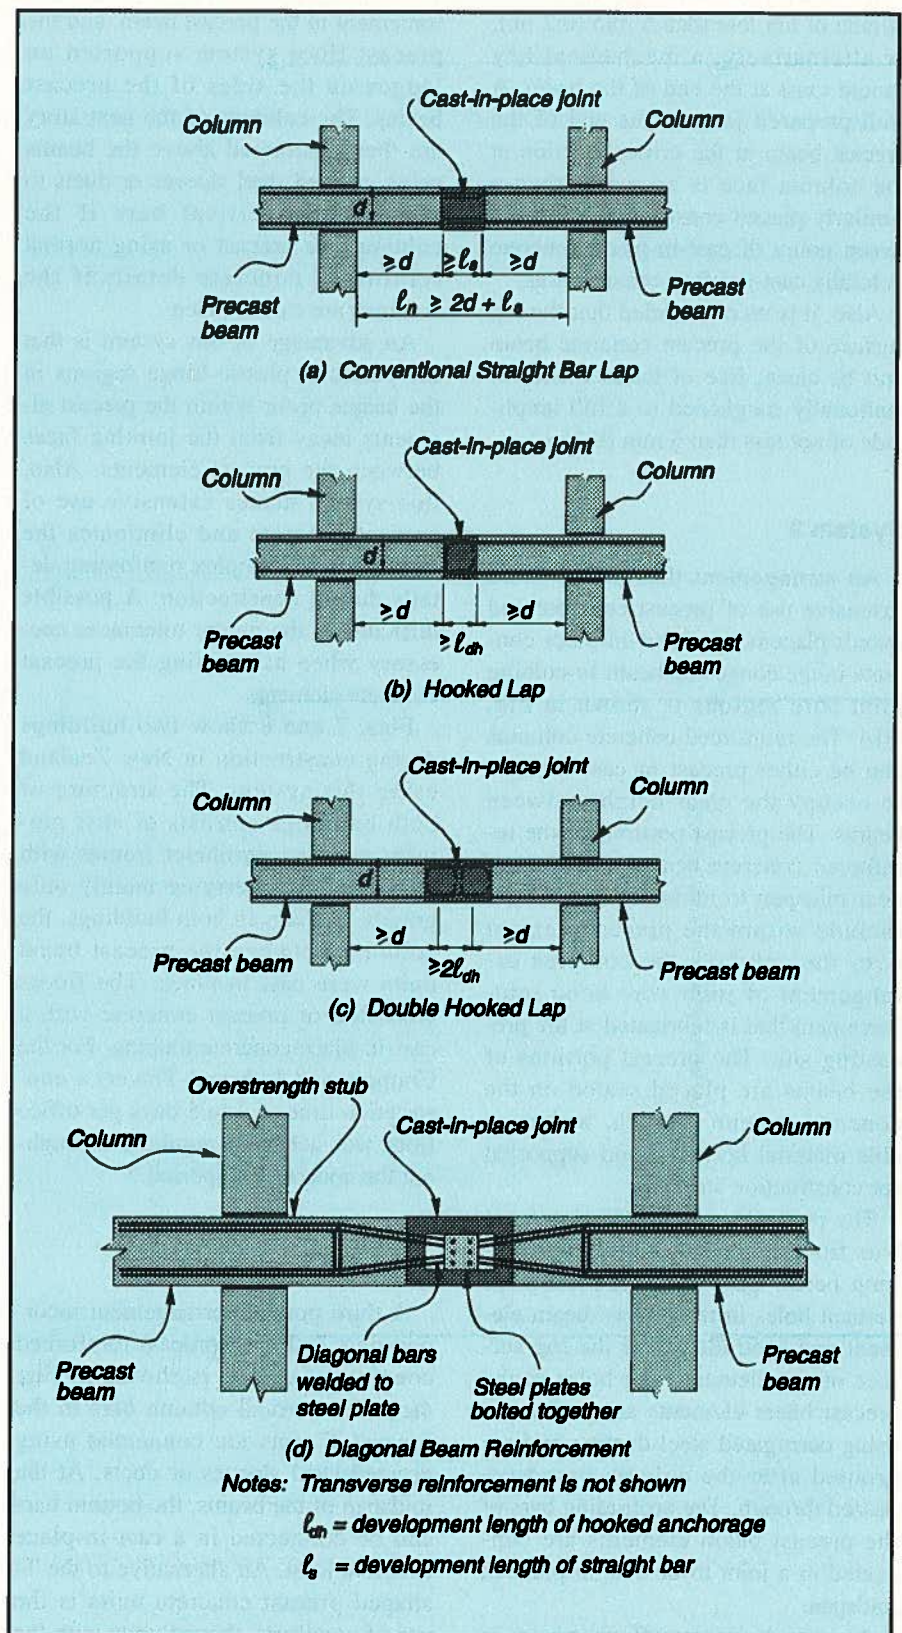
Some details for midspan connections between precast reinforced concrete beam elements that have been used in New Zealand (Ref. 3).
